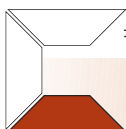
Ventilation diagram: Floor and more N 40 *with* floor covering
